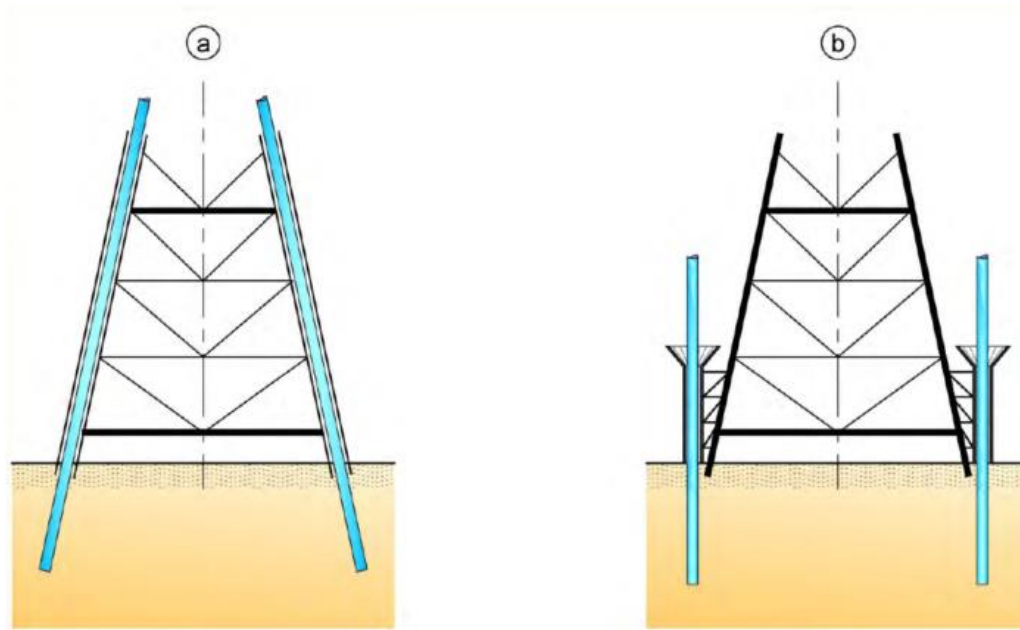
Jacket structure installation through leg piles (a) or skirt piles (b) (CFMS, 2018)
